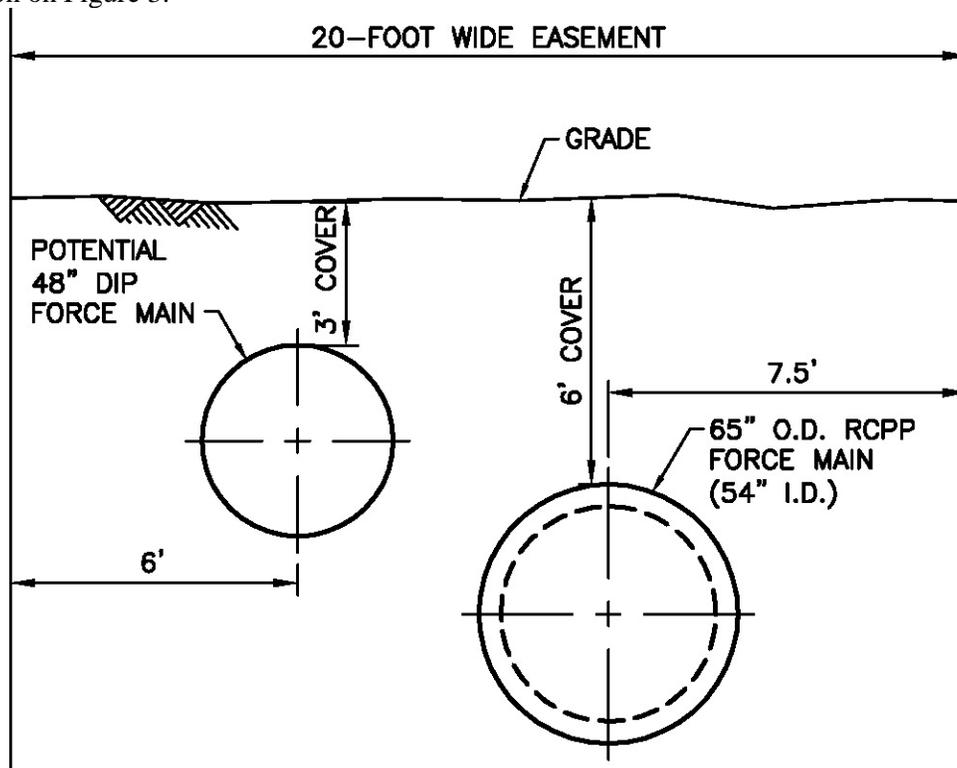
Section Looking North, Scale: 1/4" = 1'-0"
